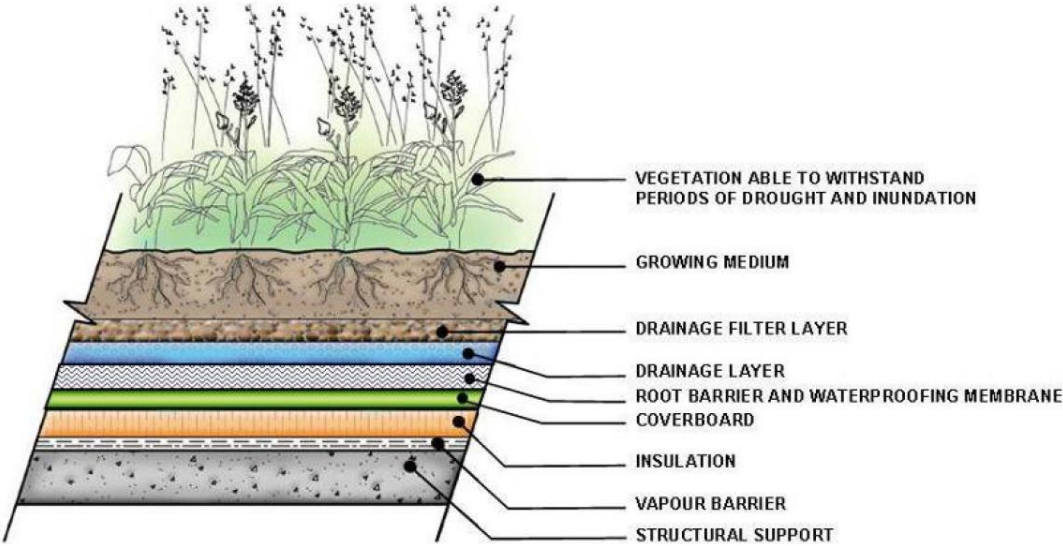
Green Roof Cross Section (Drainage Services, 2014)
